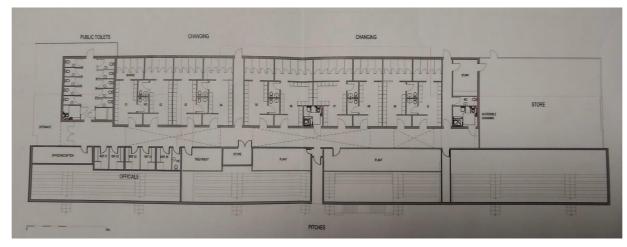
Bught stadium, layout for newbuild clubhouse, retaining existing stadium seating
